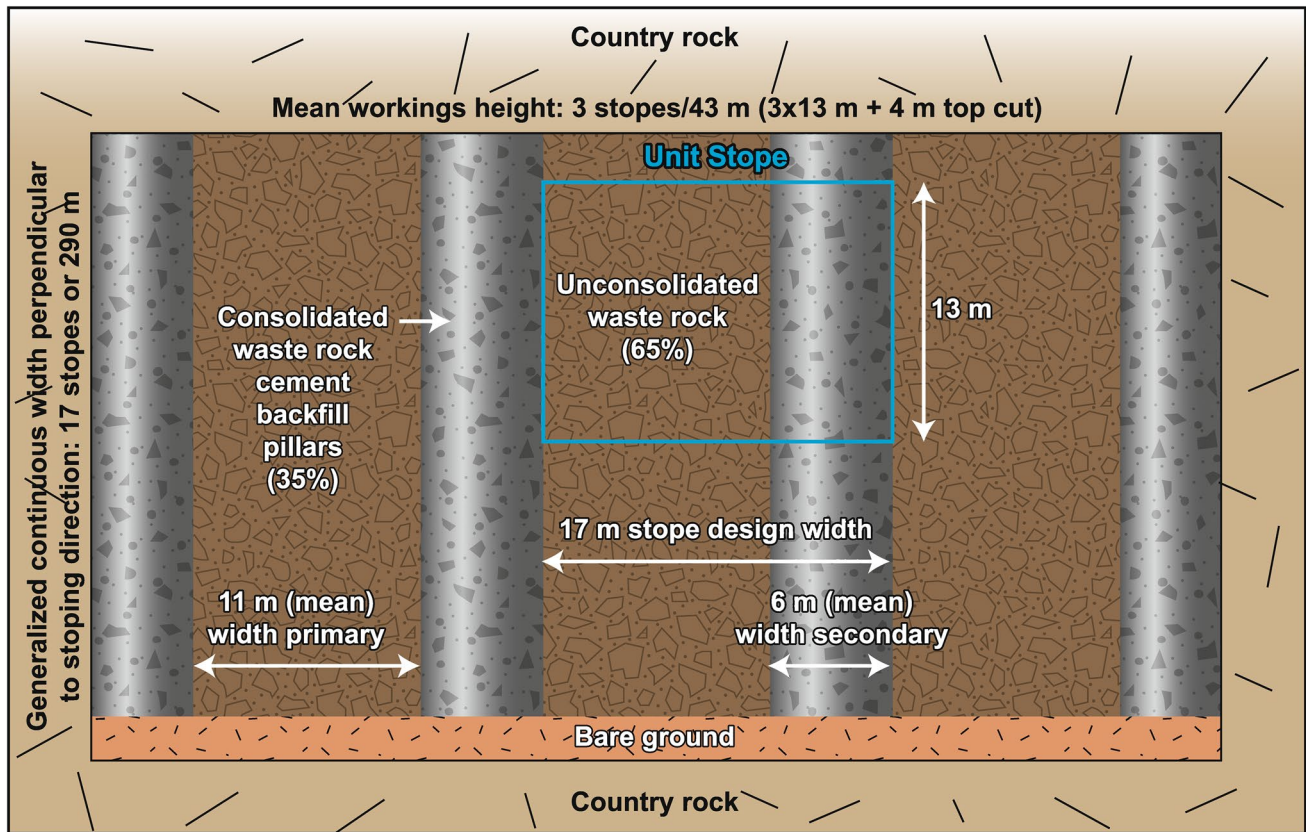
Cross-section schematic through a typical backfilled stope showing columns and unconsolidated waste rock
